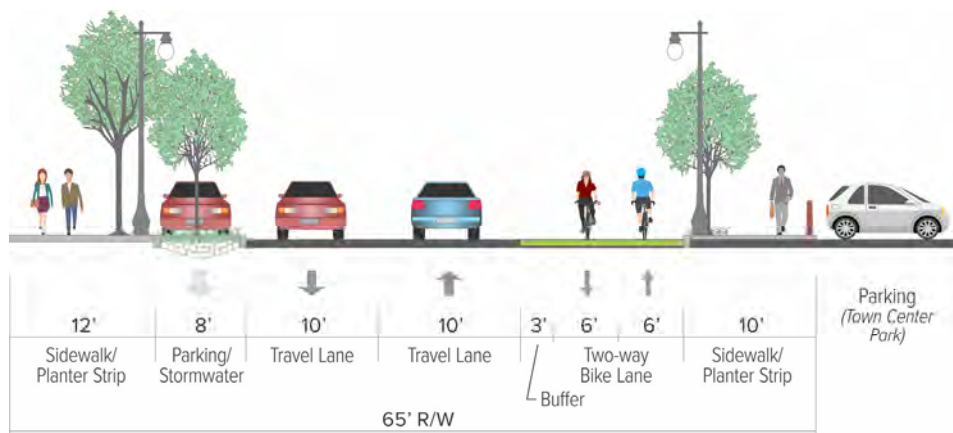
TOWN CENTER PLAN CROSS-SECTIONS (CONT.)
